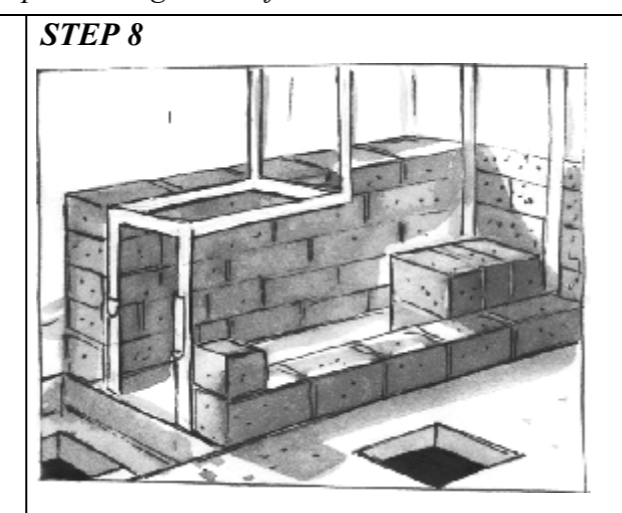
Adding refractory bricks around ash door and bridge
